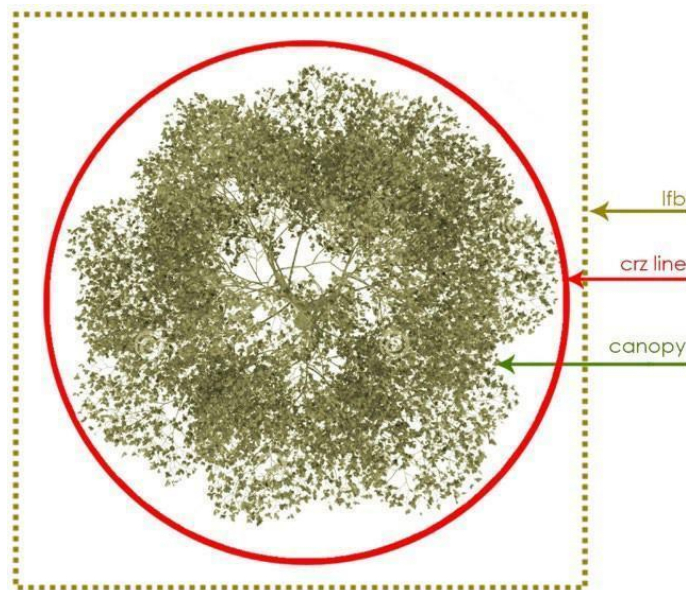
TREE PROTECTION ZONE AND BARRICADING MEASURES
